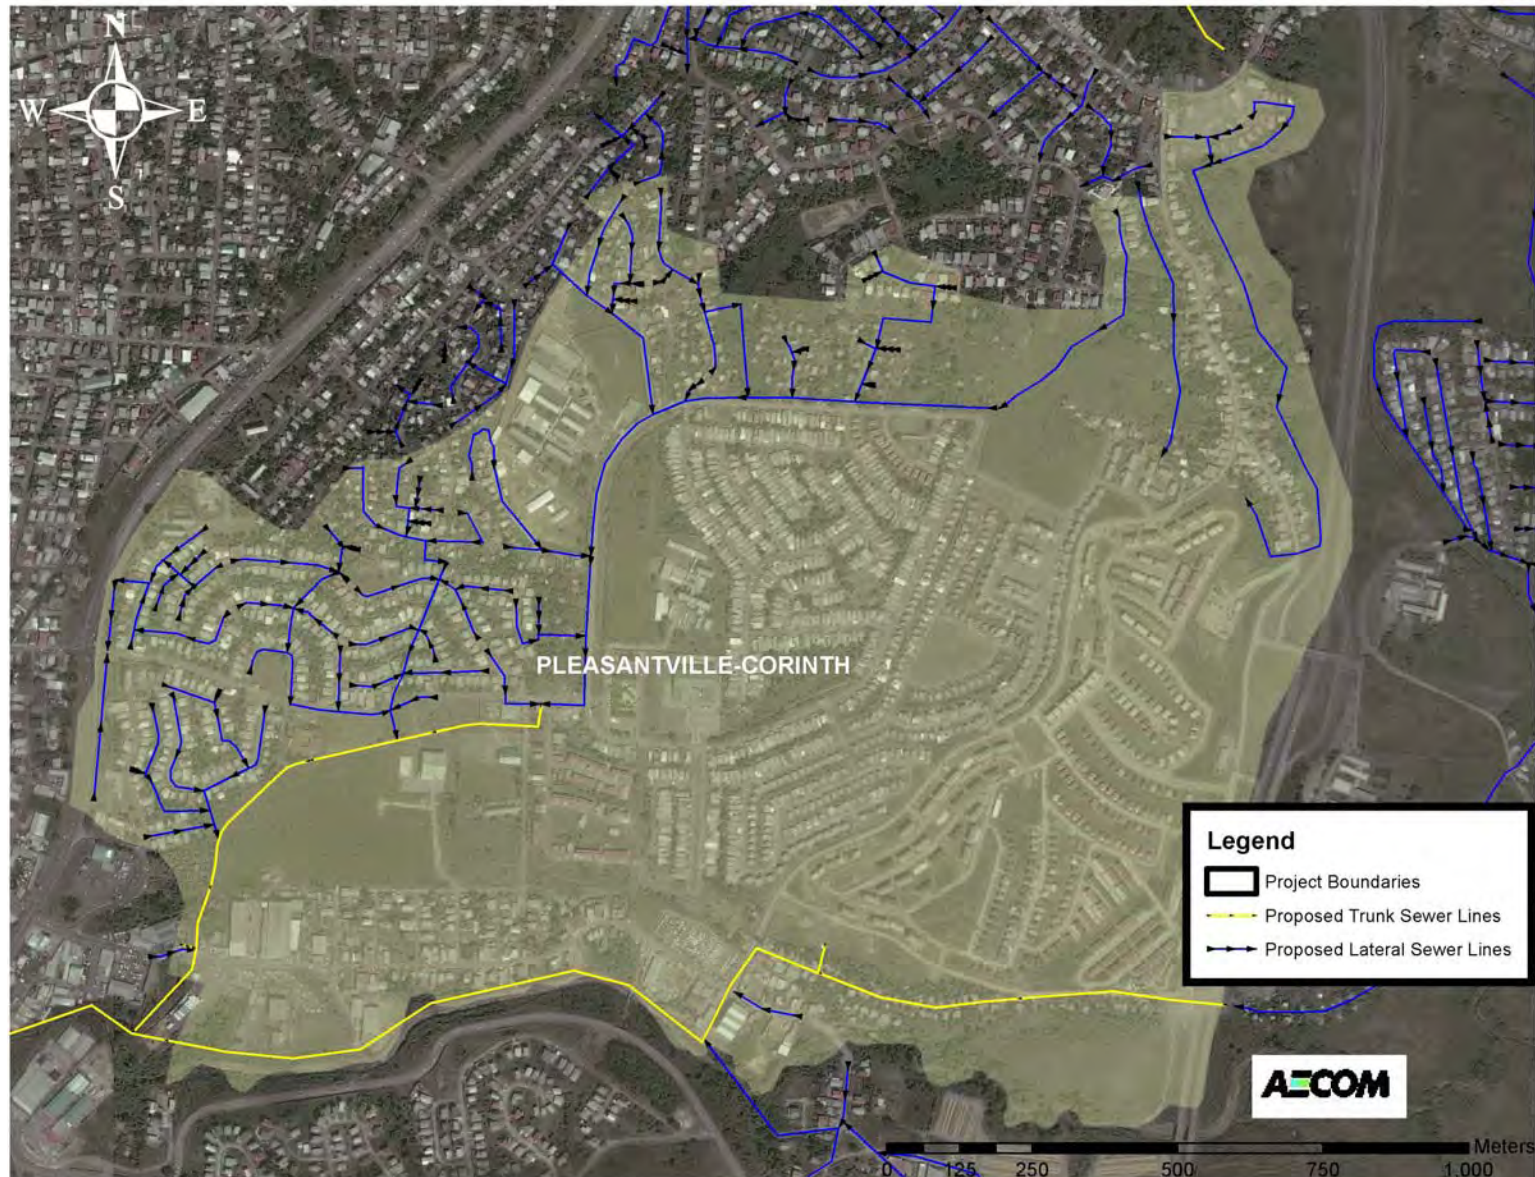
Pleasantville-Corinth Subcatchment New Sewer Layout
